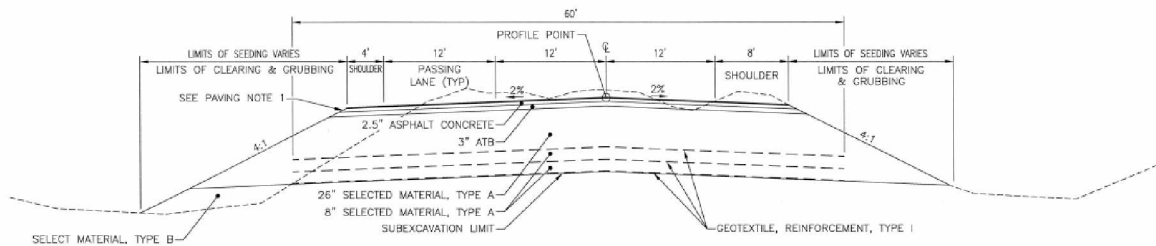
Healy, pavement structure II (image courtesy ADOT&PF)
